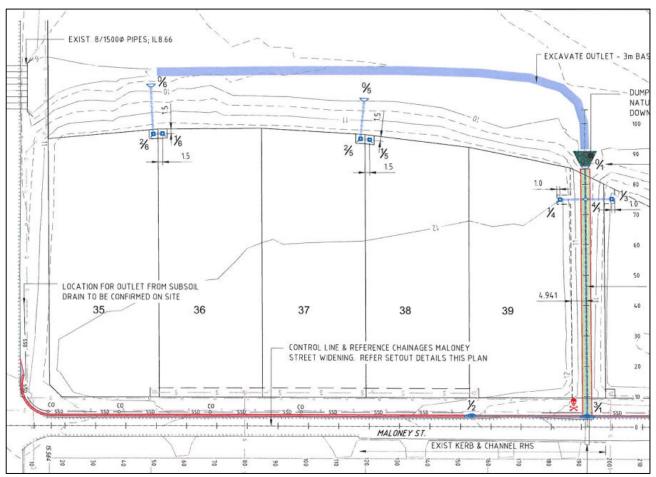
Extract of Approved Op Works Drainage Plan
